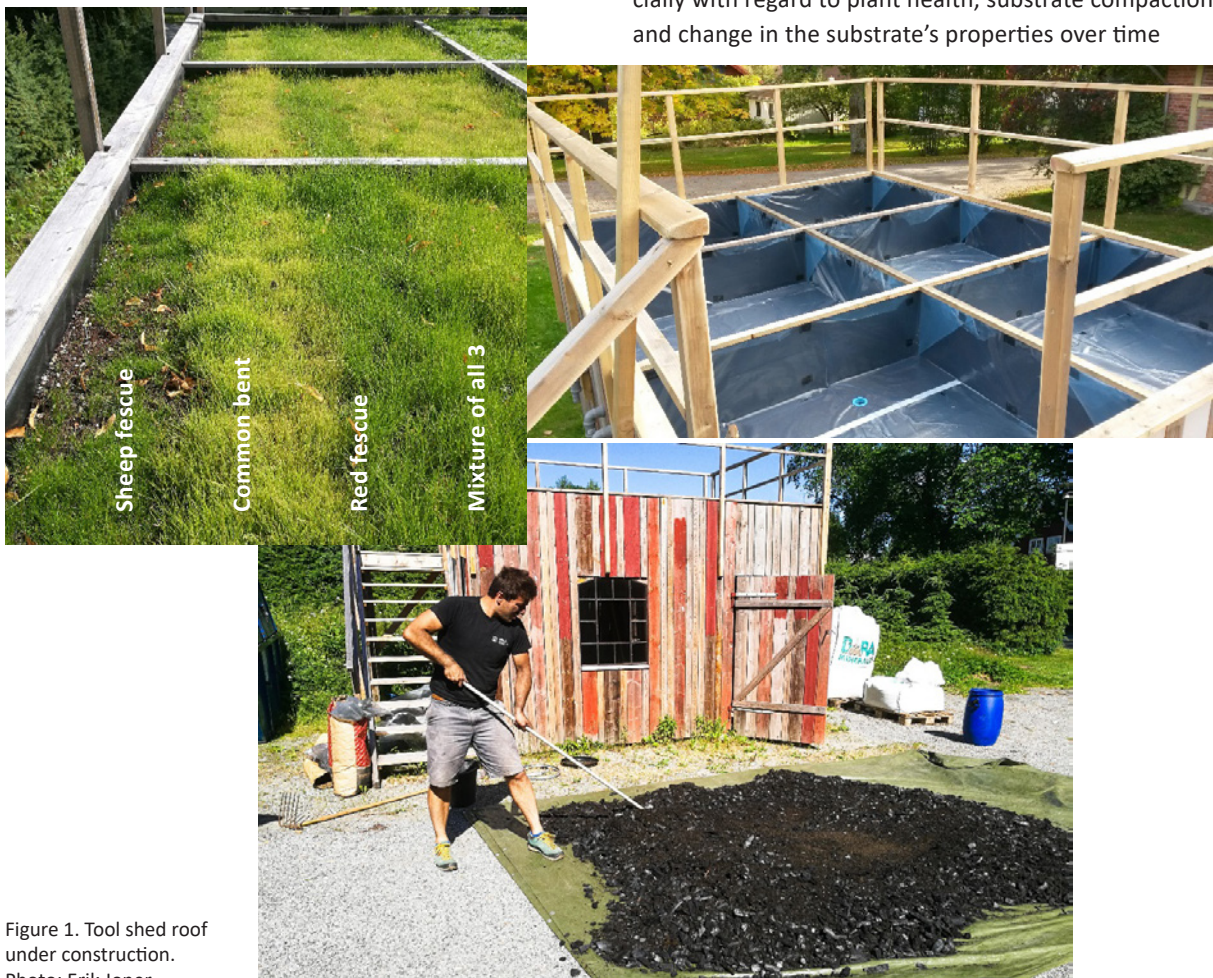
Tool shed roof under construction. Photo: Erik Joner
